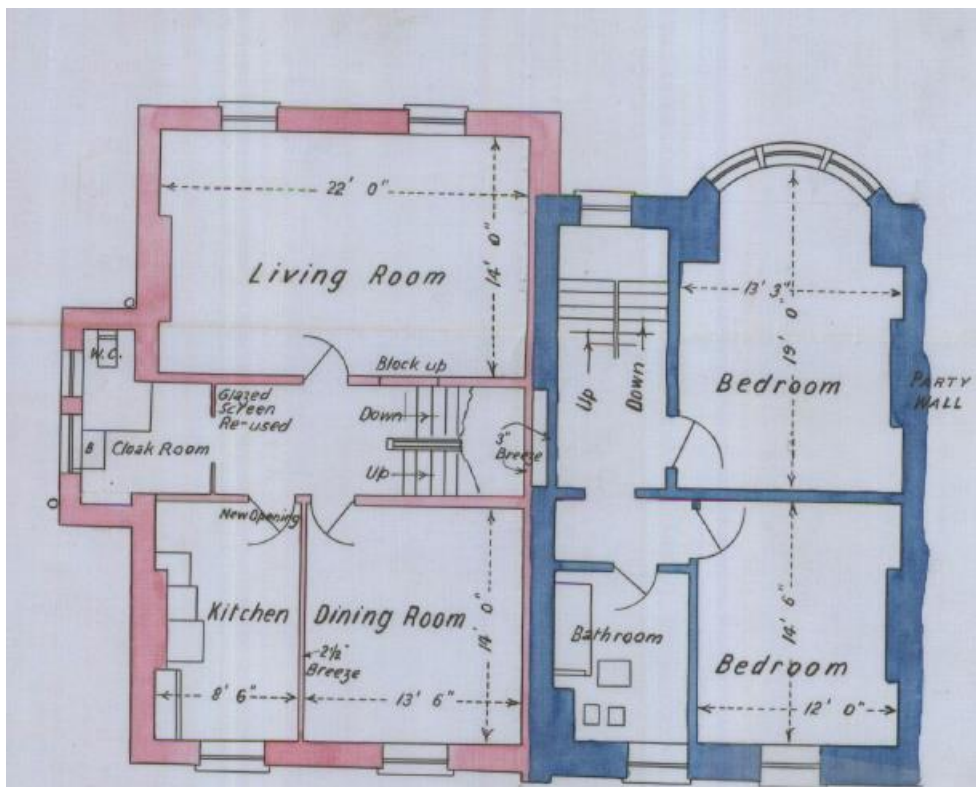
The first floor plans in 1948 after subdivision (Client's records)
